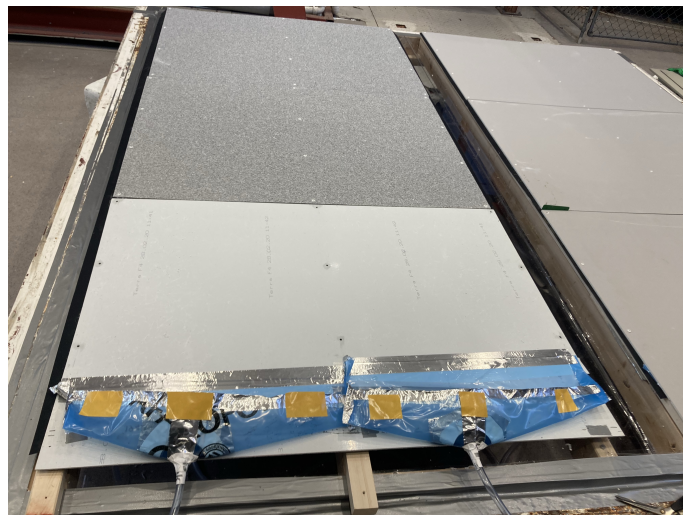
To avoid water intrusion behind the gutter system the top of the gutter is taped with aluminium tape. Double-sided tape is fastened to the "front" of the gutters.
